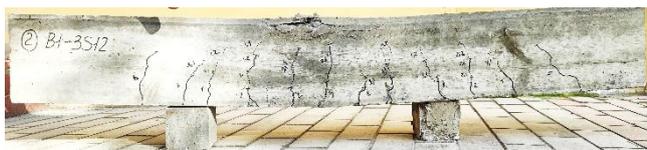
Stages of formation and development of cracks in beams under load
